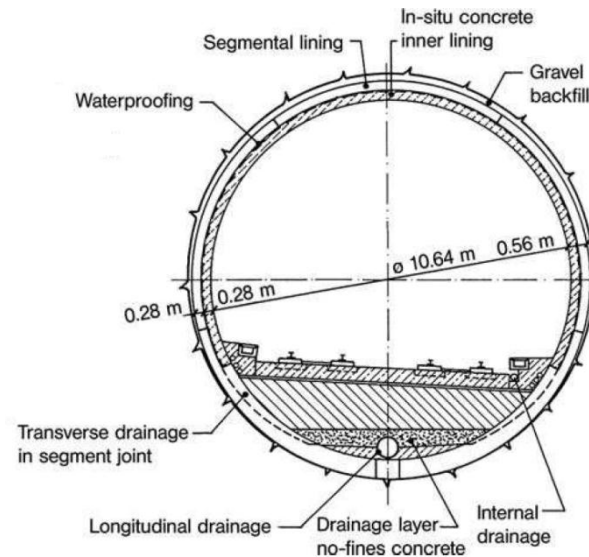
Structure of drained double-layer tunnel linings of Murgenthal tunnel (Switzerland) in hard rock (sourced from [81])
